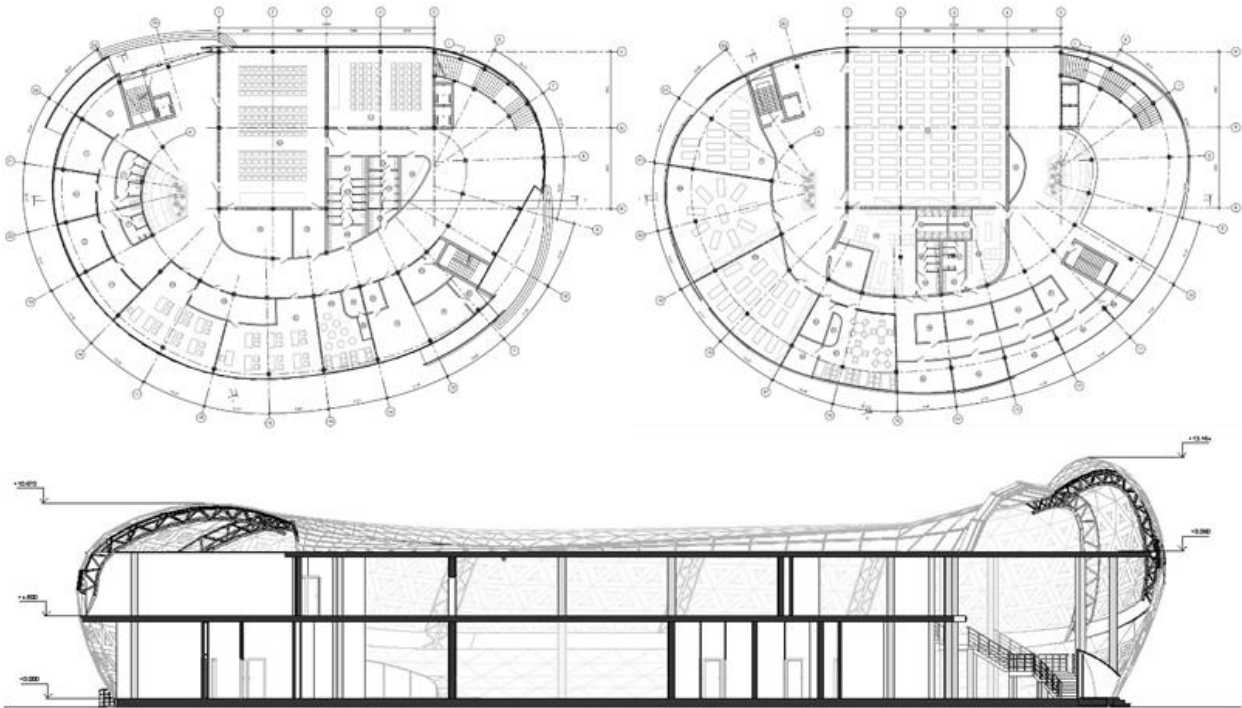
Layout of the yoga centre and structural cross-section of the building
